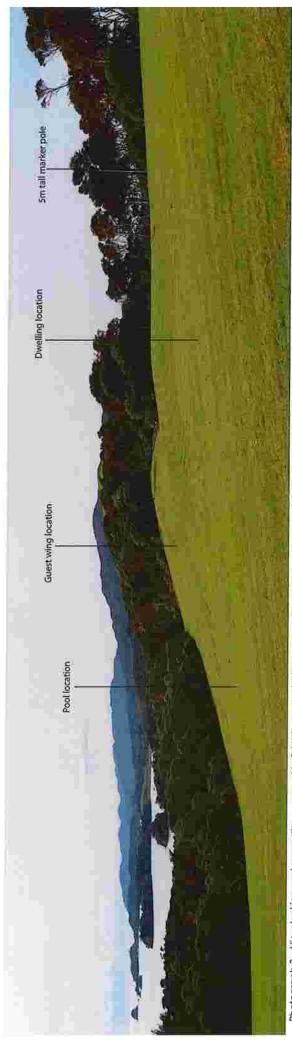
View looking west from the eastern end of the house site, showing the existing grassed area that is proposed as the buildable area, set with the surrounding native vegetation.
